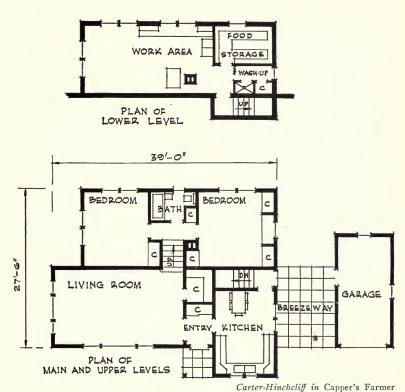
Floor plan of 3-level farmhouse shown in Figure 98.
